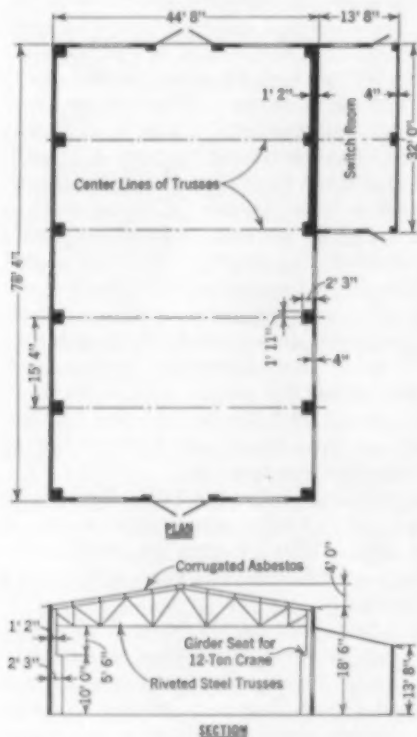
PLAN AND SECTION OF REINFORCED BRICK COMPRESSOR HOUSE
